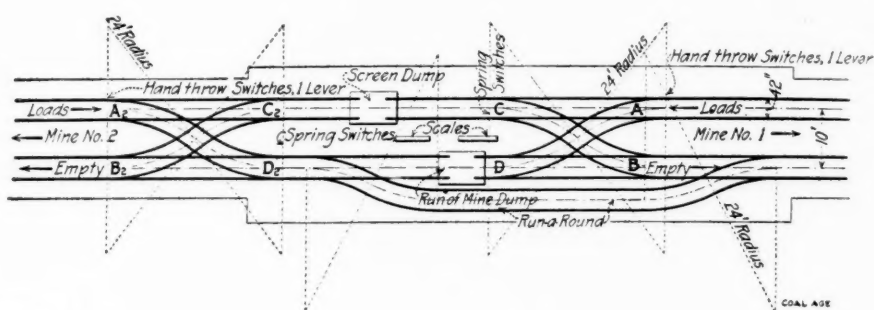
TRACK PLAN, SHOWING TWO DUMPS AND ARRANGEMENT OF SWITCHES
